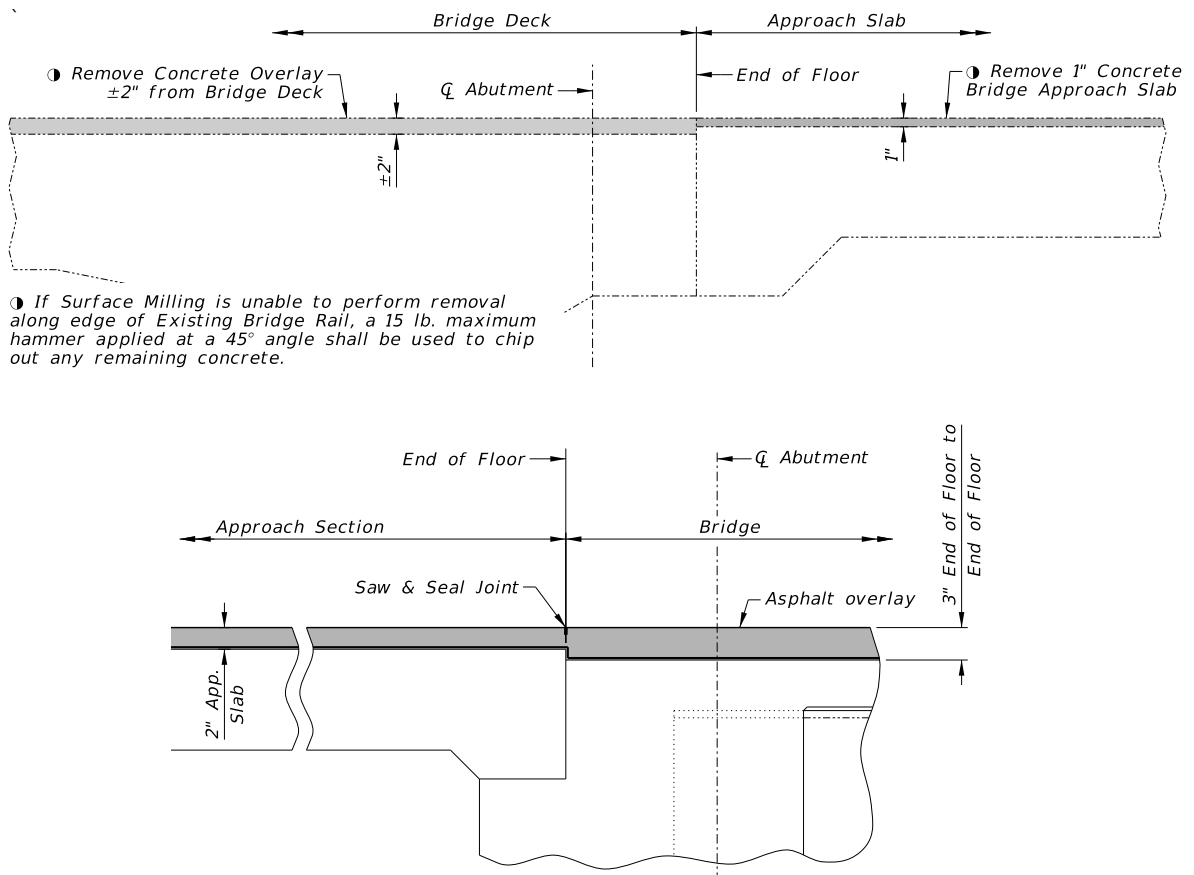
Removal and Asphalt Overlay Detail for Bridges with Existing Concrete Overlays (example taken from S025 00256, CN 71227, 2023)
